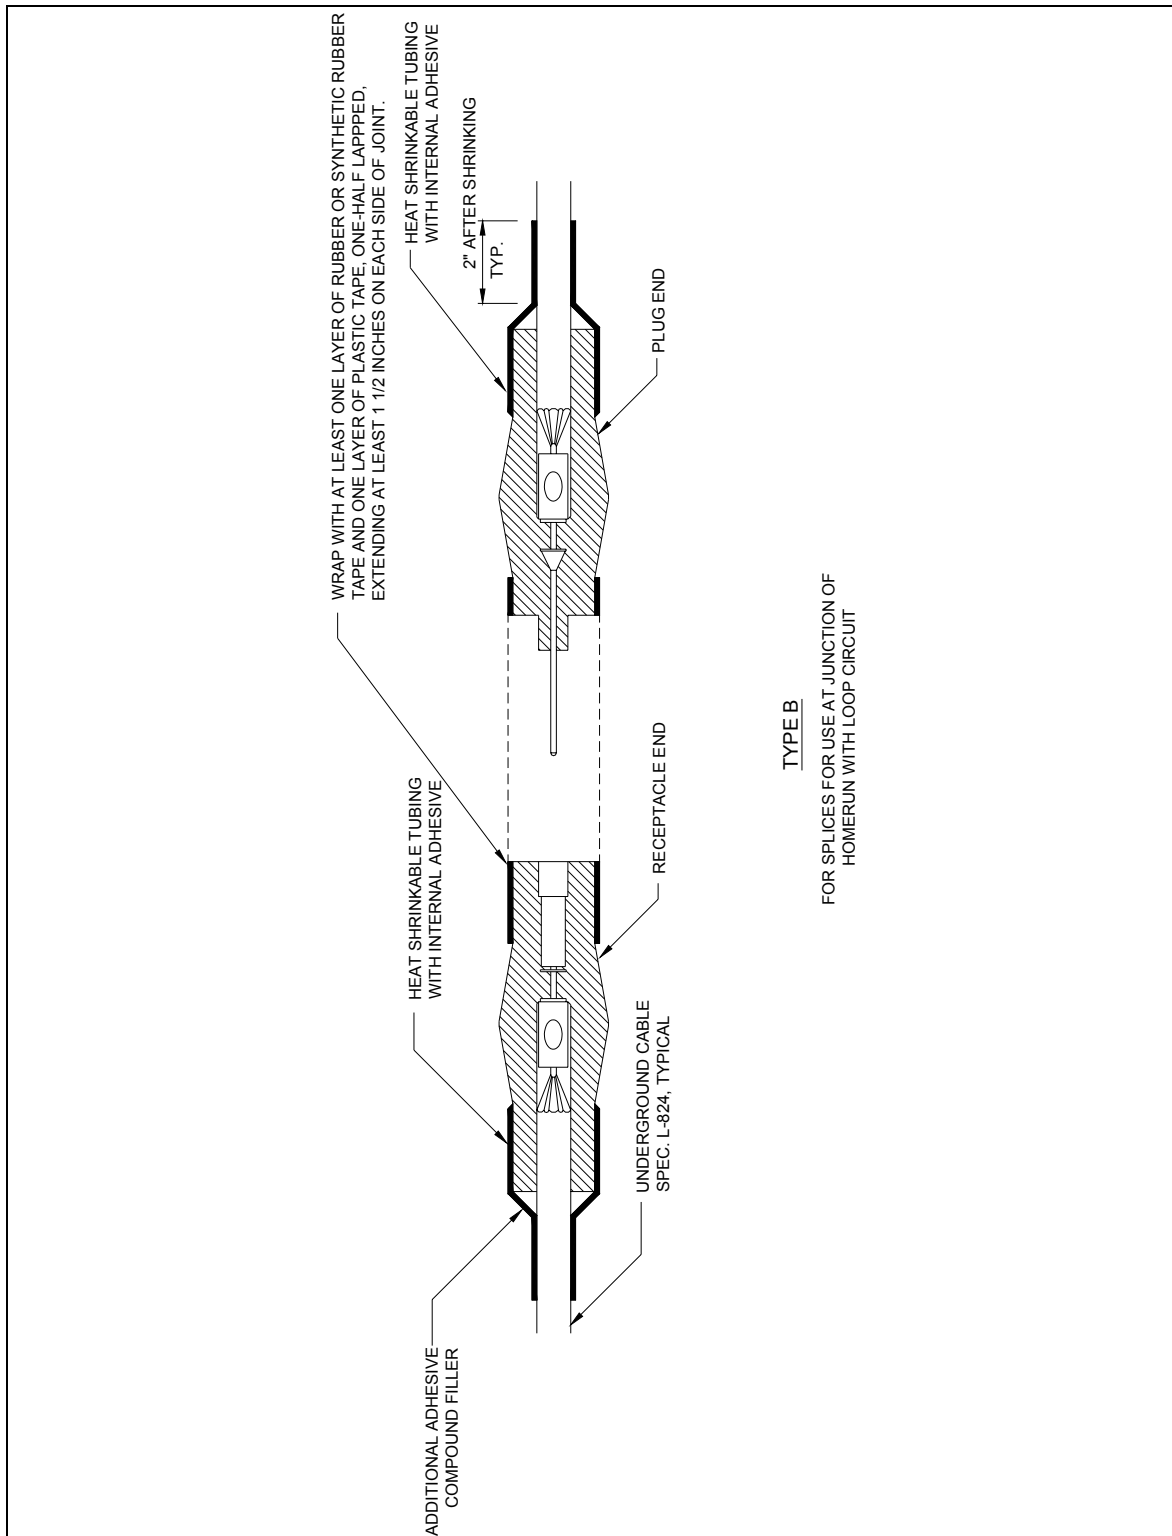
Standard Details for Underground Cable Installation – GL-600 Sheet 2E – Type B
